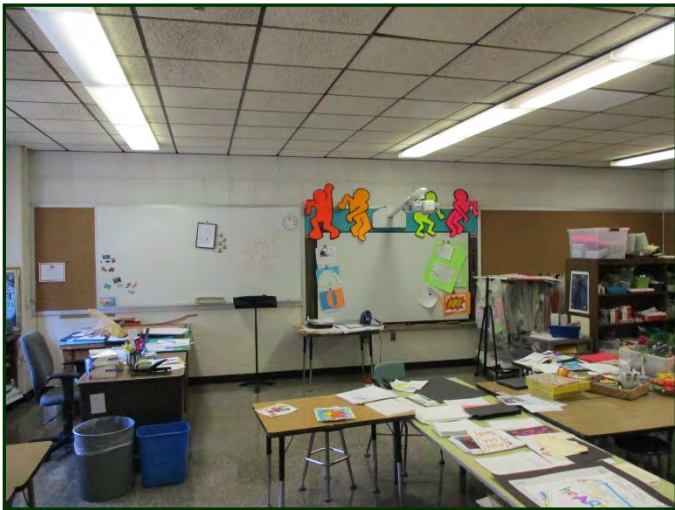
Typical classroom with VAT (reportedly) flooring, aged acoustical ceiling system & painted CMU walls
